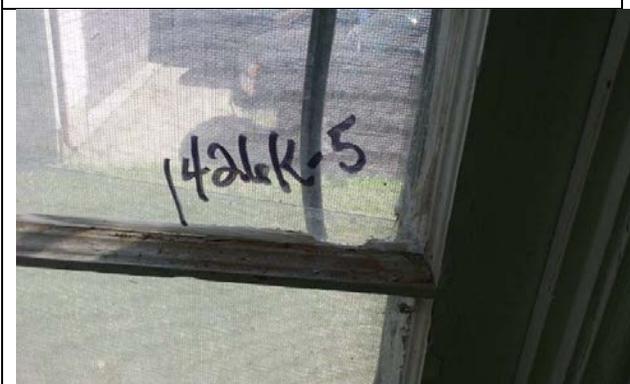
Window Glazing (1426K-5) Bedroom 2, Wall D.
